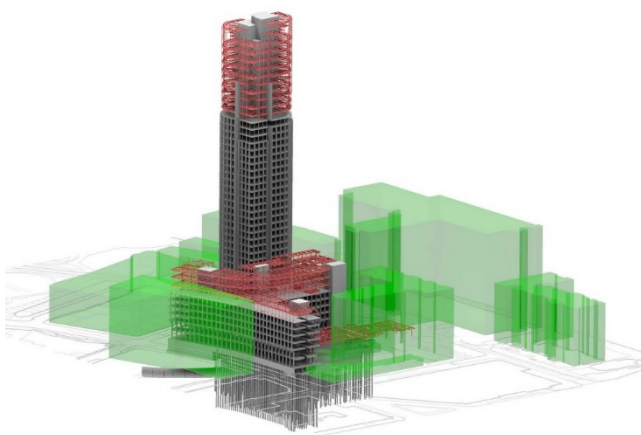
3D model of the Southbank Tower extension, showing the original structure (grey), additional steelwork (red) and surrounding buildings (green). (© AKT II)
